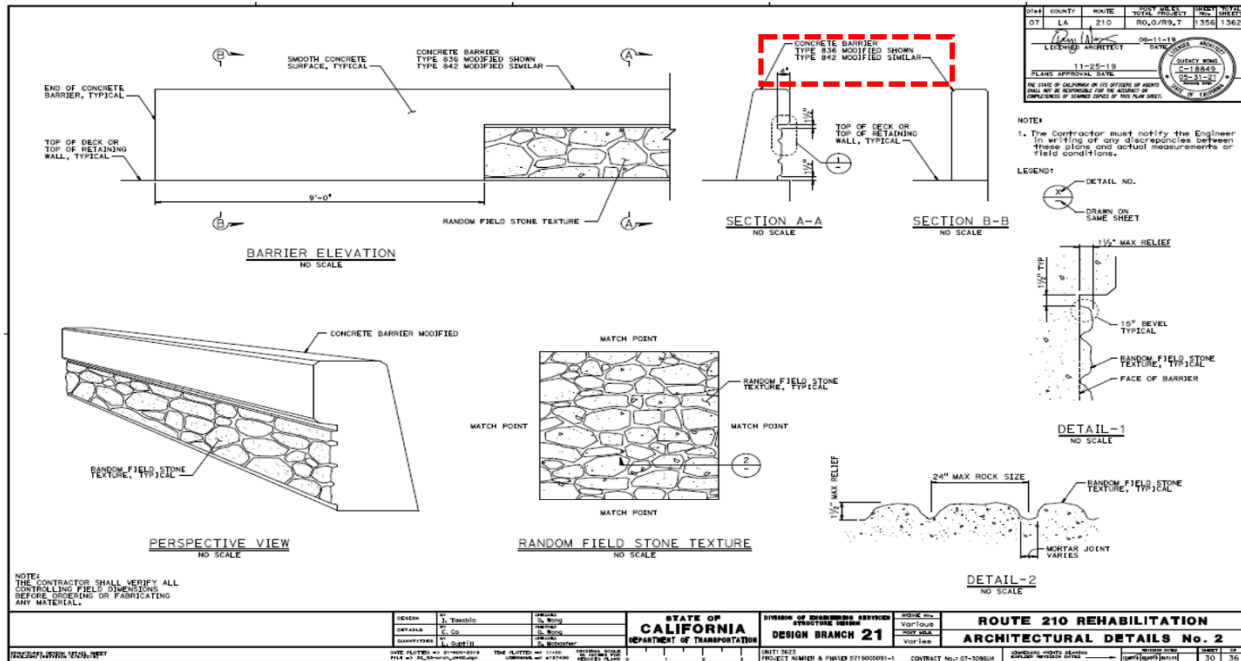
Contract Plan Showing Barrier Type 836 Modified to Add Architectural Details
